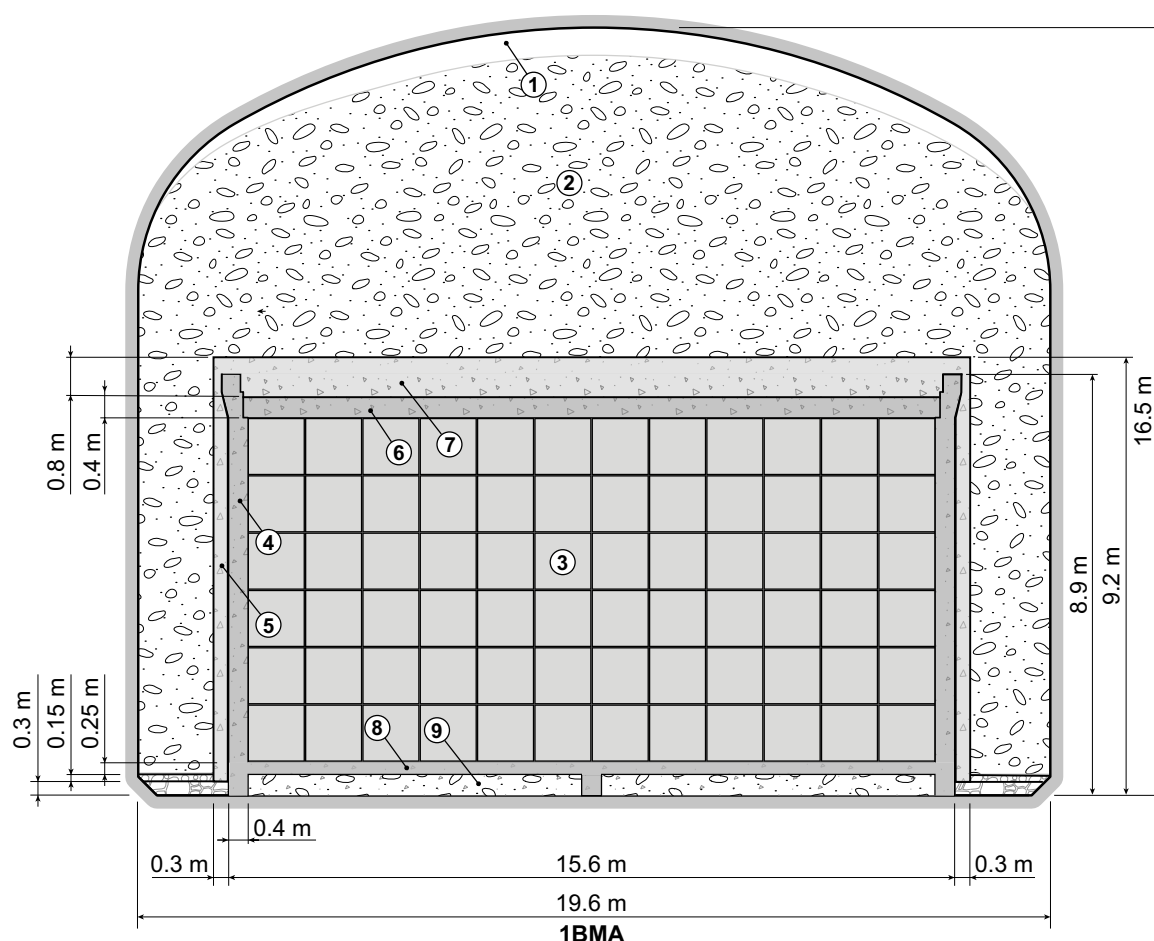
Schematic cross-section of 1BMA after restoration of the walls and closure. Key to numbering: 1) Void 2) Macadam backfill 3) Waste domain 4) Existing outer wall 5) New outer wall 6) Pre-fabricated concrete element 7) New concrete lid 8) Slab 9) Crushed rock.
